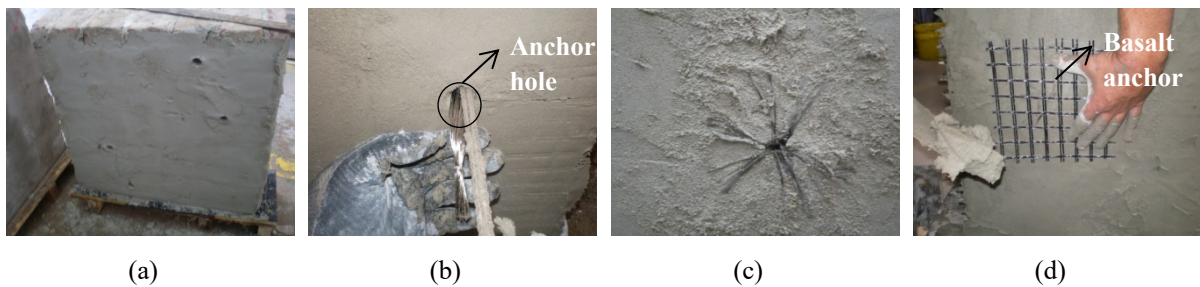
Anchorage application (a) anchor holes, (b) installation of anchor, (c) basalt anchor, and (d) square patch
